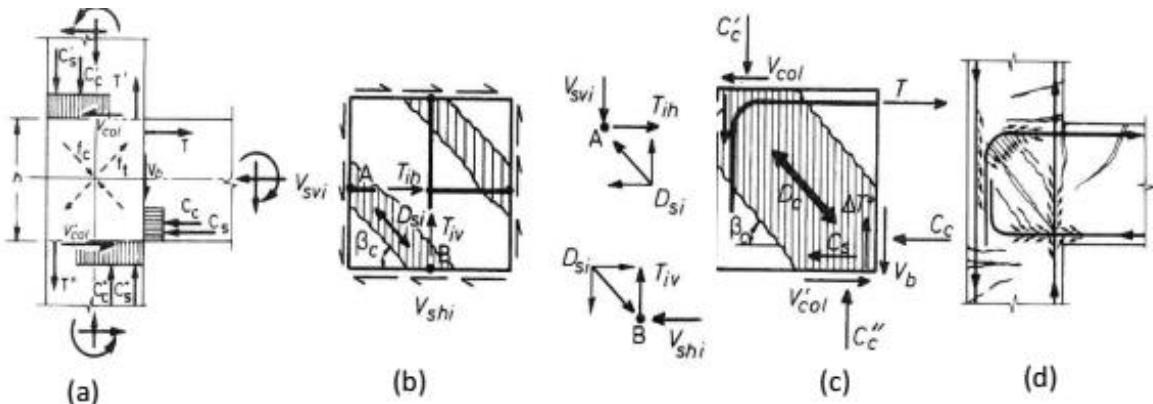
Forces transmitted to the joint core (a) forces acting on the joint core, (b), (c) strut mechanism, and (d) truss mechanism [63].(a) (b) (c) (d)
